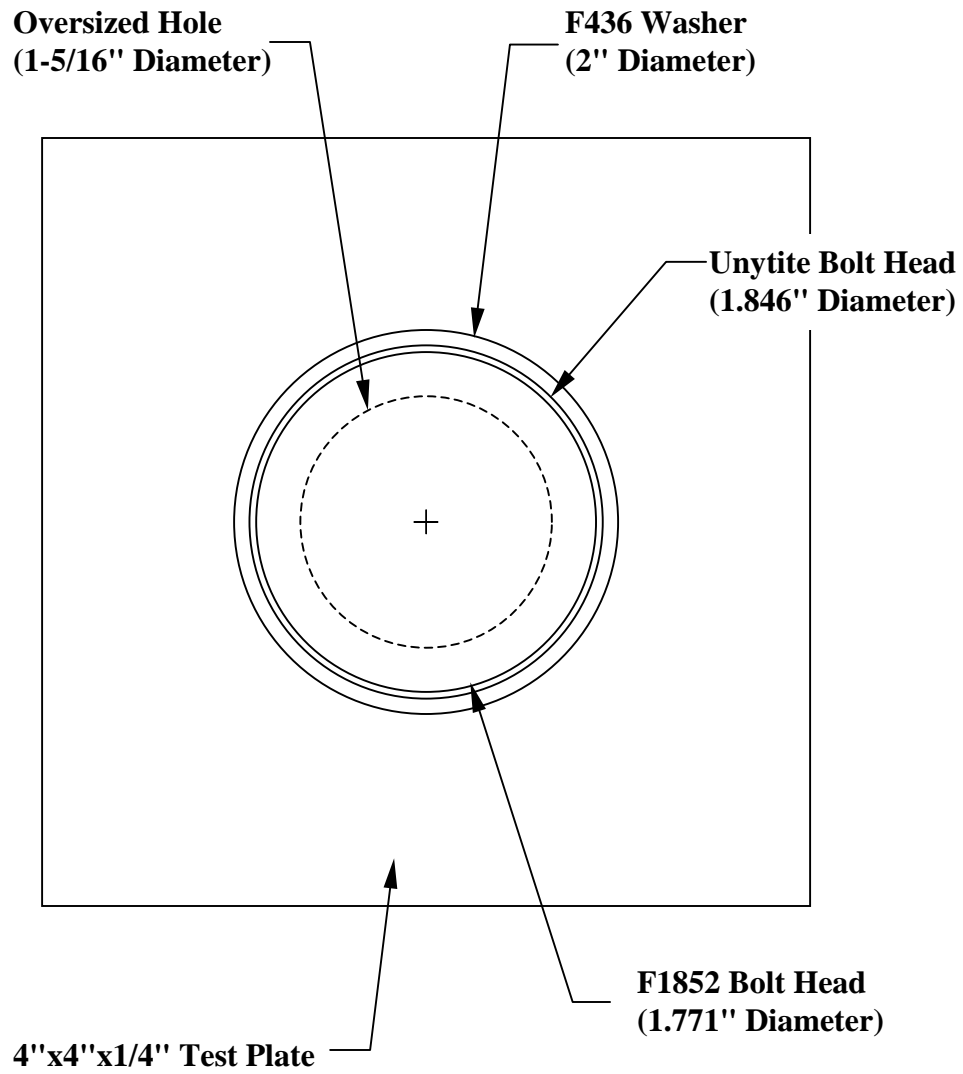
Bolt and Plate Layout for 1" Bolt in Oversized Hole
